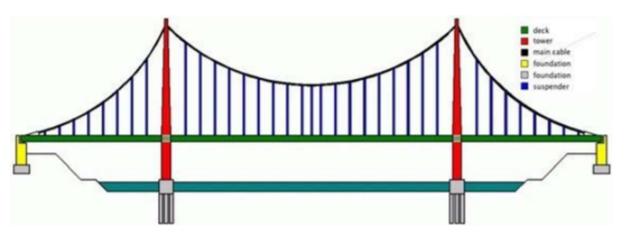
Labelled Suspension Bridge [59]
